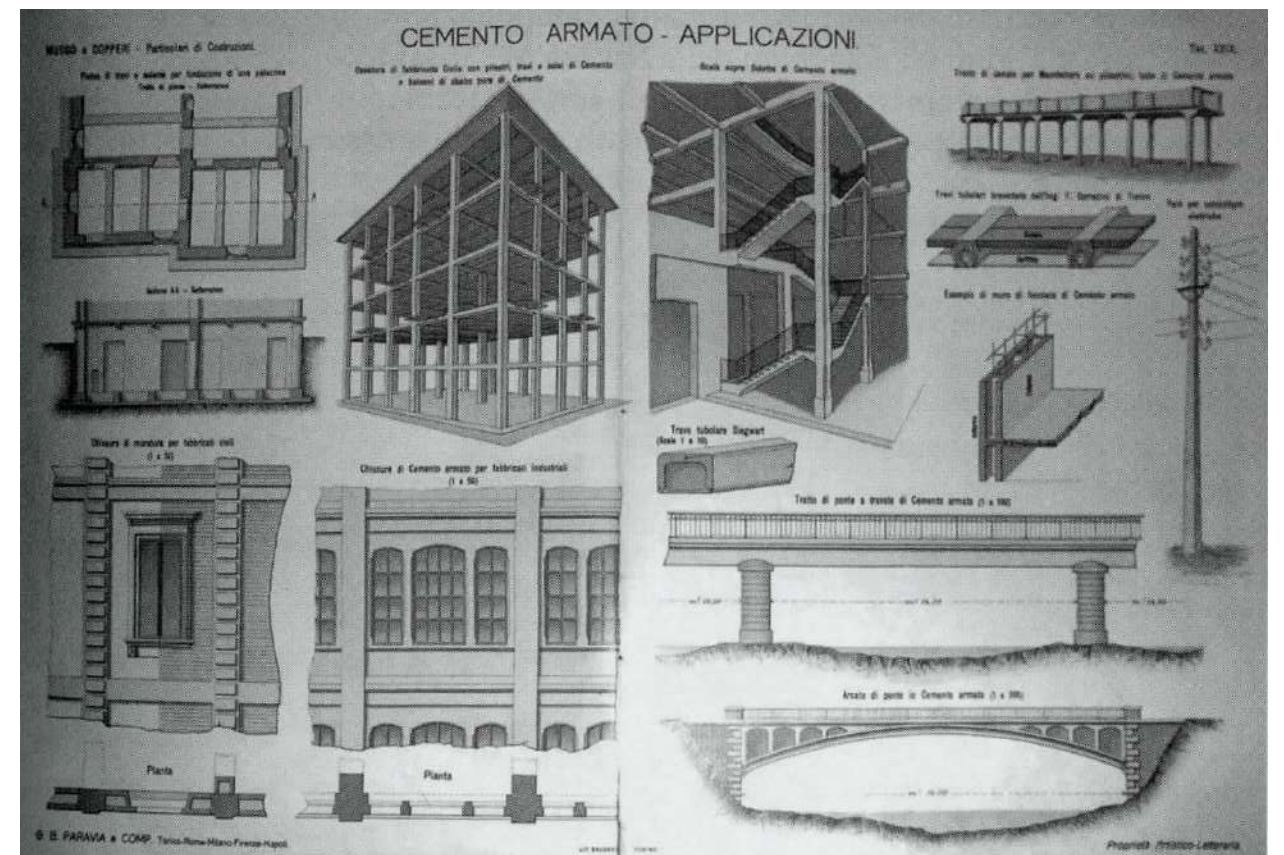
Constructive detail of reinforced concrete structures. Source: G. MUSSO, G. COPPERI, Particolari di costruzione murali e finimenti di fabbricati.
